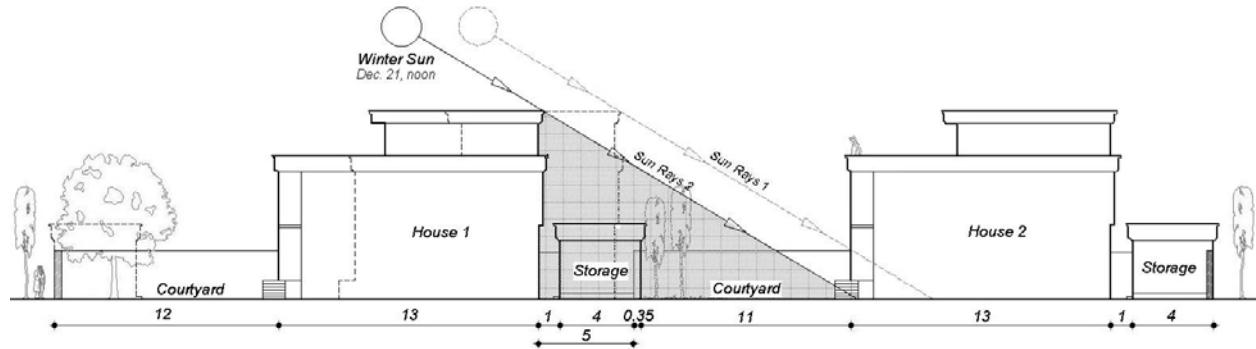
The first floor of house 2 will not receive winter sun unless there is a setback from the boundary wall for house 1 (Drafted by the author).
